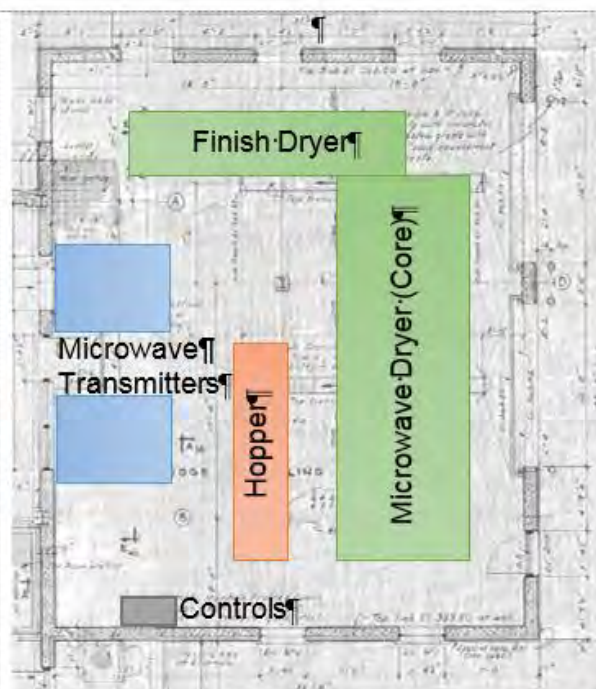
Conceptual Layout of Burch BioWave Equipment in Addition
